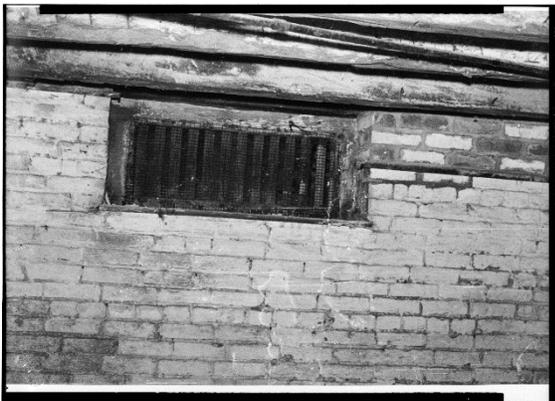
Ventilation window in the basement with view of floor beams above ca. 1960. (Photo courtesy of HABS).
